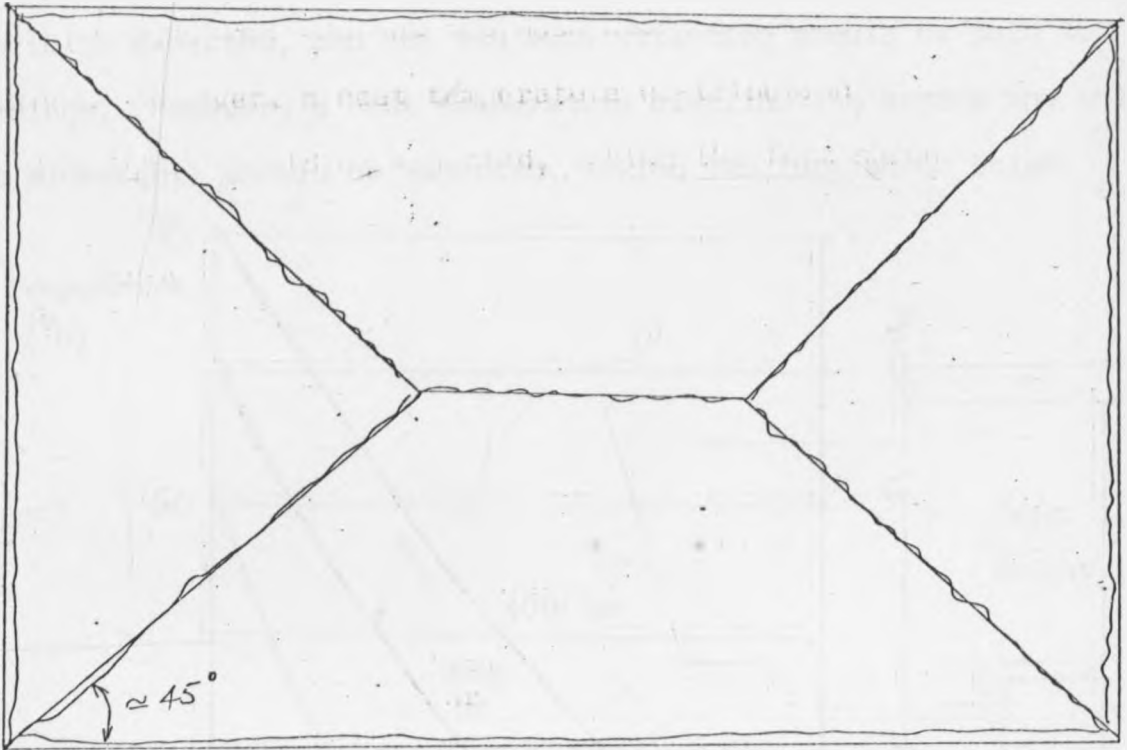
(b) Yield Lines at Failure for Wall and Roof Slabs
